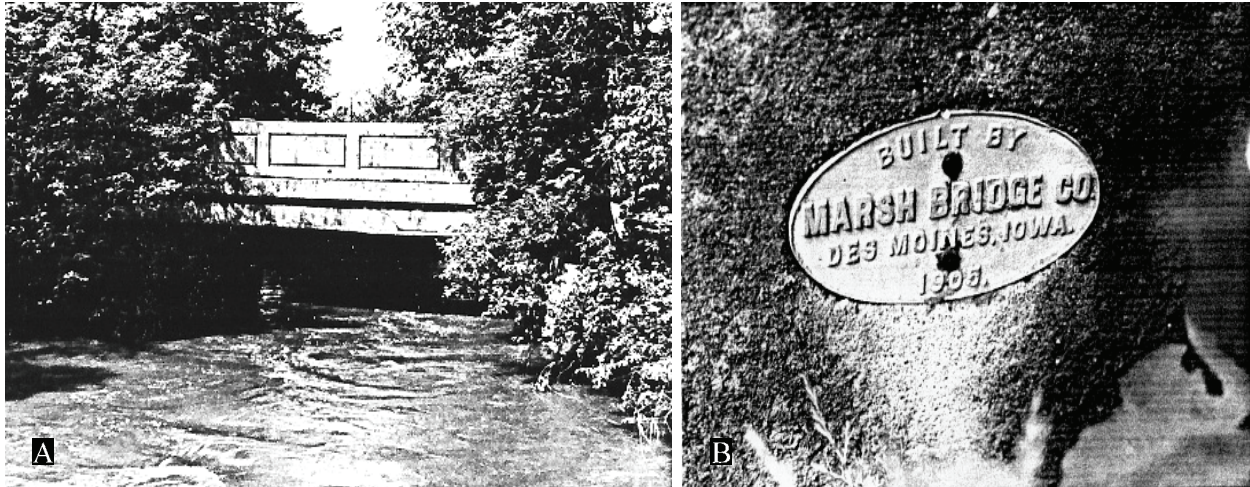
A. View of 1905 Marsh concrete bridge. B. Detail of original plaque. 2003 survey photos.
